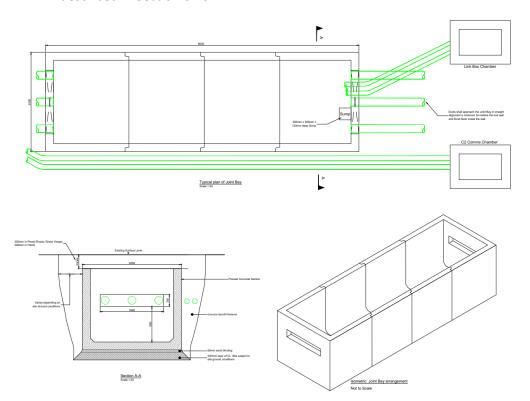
Typical detail of a joint bay - extract from planning drawing no. 229100714-MMD-00-XX-DR-C-0053
